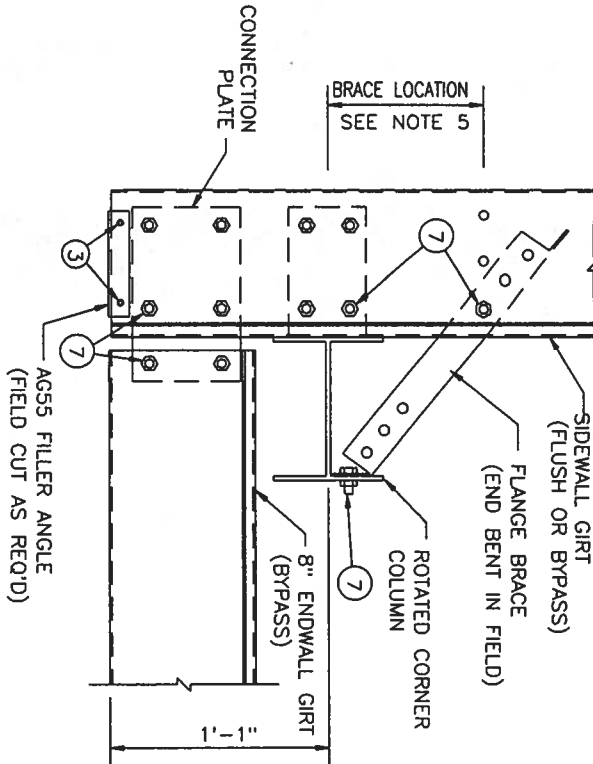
DETAIL: GIRT LAP & FLANGE BRACE PLACEMENT
